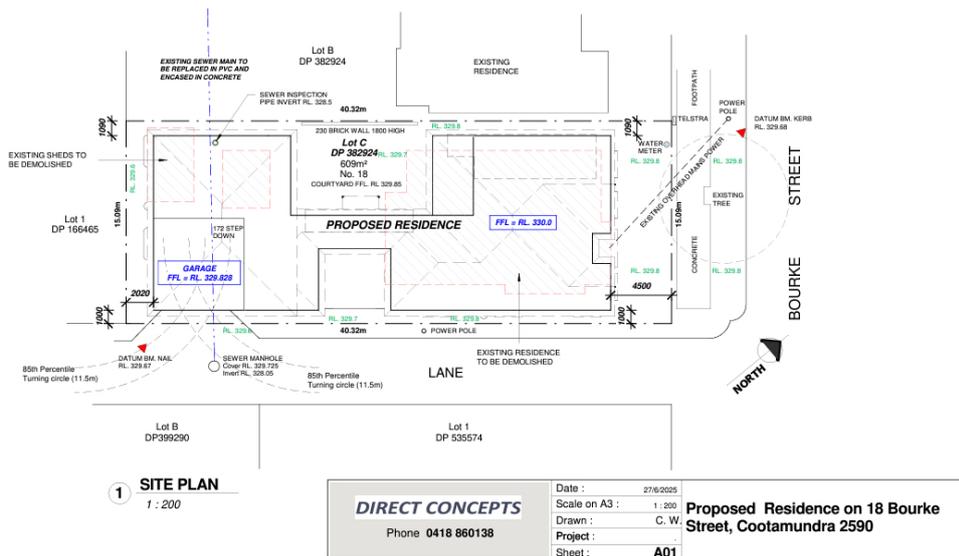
Proposed Plan for New Dwelling (Source: Direct Concepts, 2025) [not to scale].
